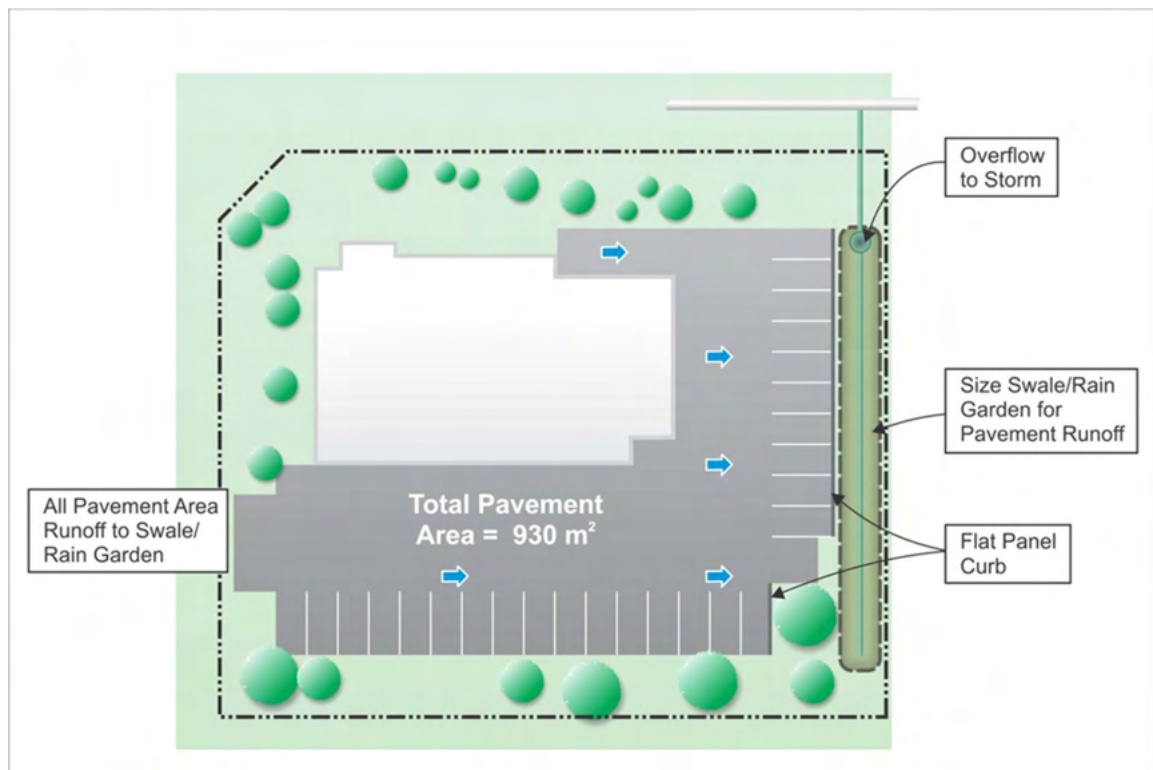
Example – Parking Area Draining to Infiltration Swale
